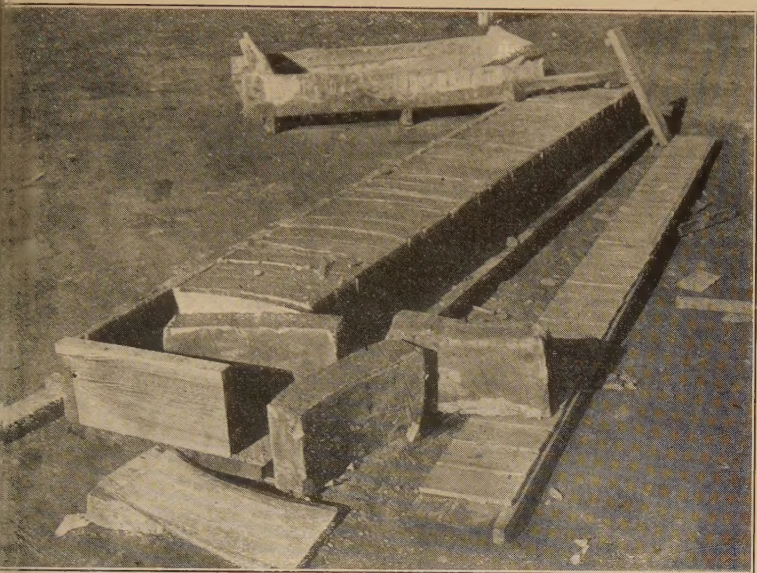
Mold for homemade concrete silo blocks 16x8x4 inches. One side of mold removed showing spacing blocks
